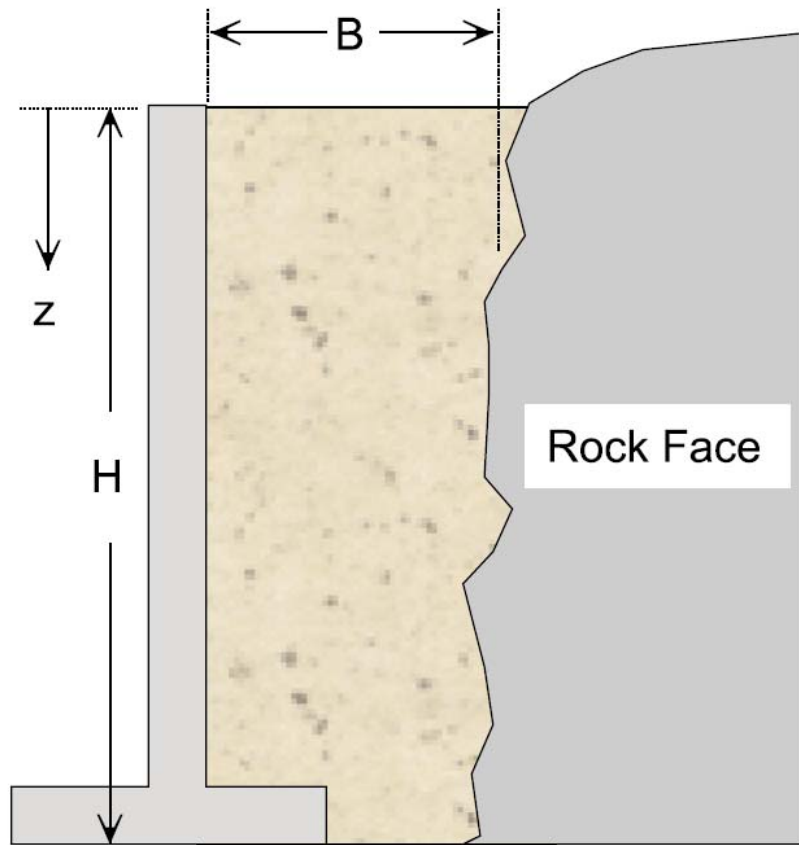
Fascia retaining wall of backfill width, B , and height, H .
